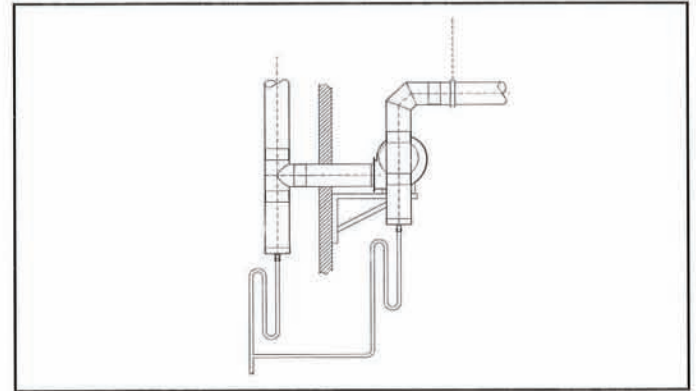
Stainless steel telescopic through the wall arrangement (available for Type '0' and Type '2' fans)
